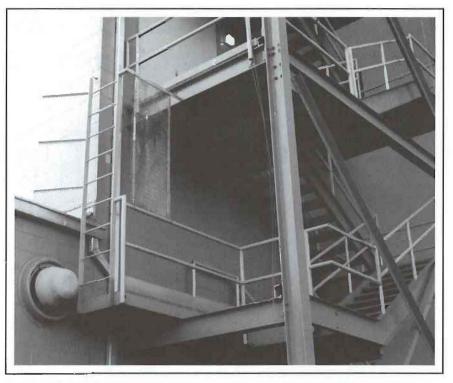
above, shows guards to protect supports from accidental strikage. Photo 4 at right, a fixed guarded ladder. Photo 5 below right, installation of stairway to check fluid levels in pumps.
